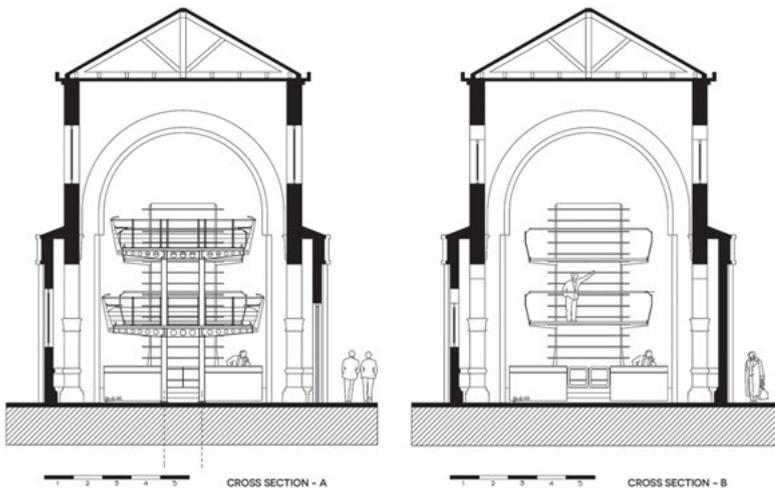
La Capilla, transverse sections. © Carlos Campuzano Arquitectos.
